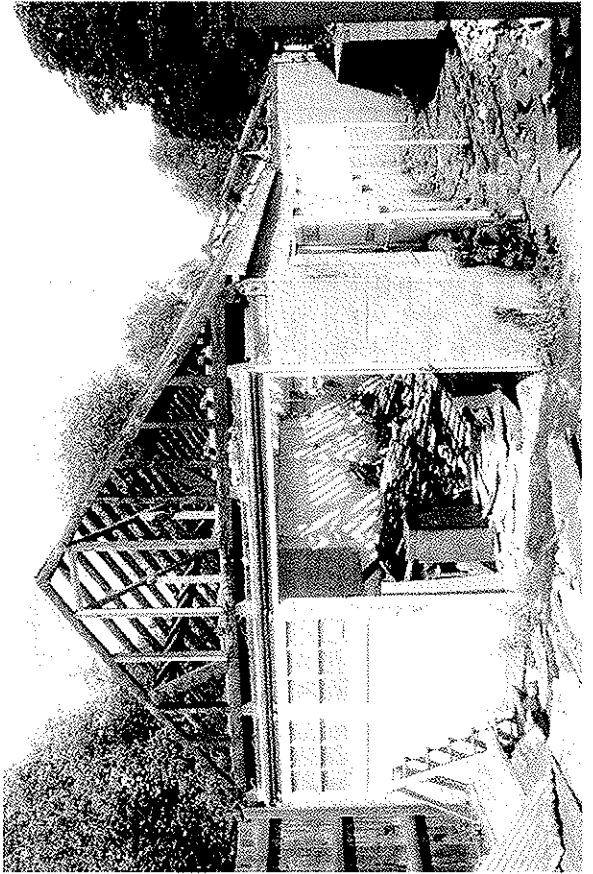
Interior of building B/1.1-1.2 from the west showing primary roof structure and timber post set into walls. Note hardwood off-cuts from machine sawing operations.
